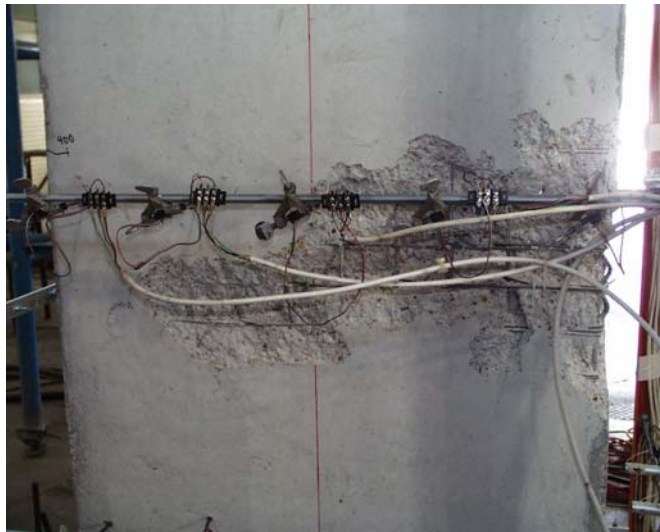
Specimen P8: Photo of East Wall at End of Test
